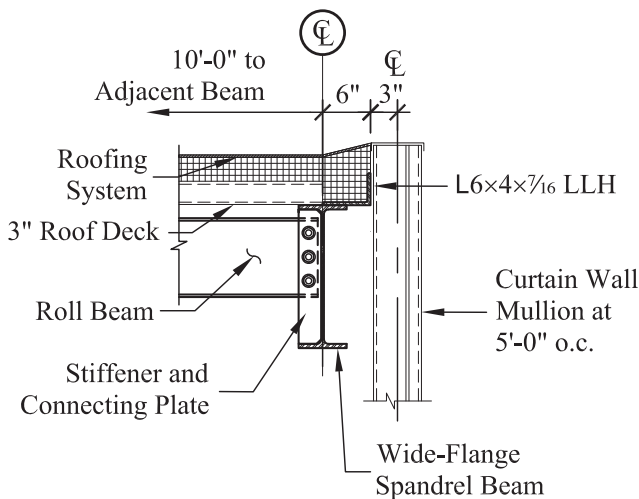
Section of roof spandrel beam with eccentric curtain wall.
